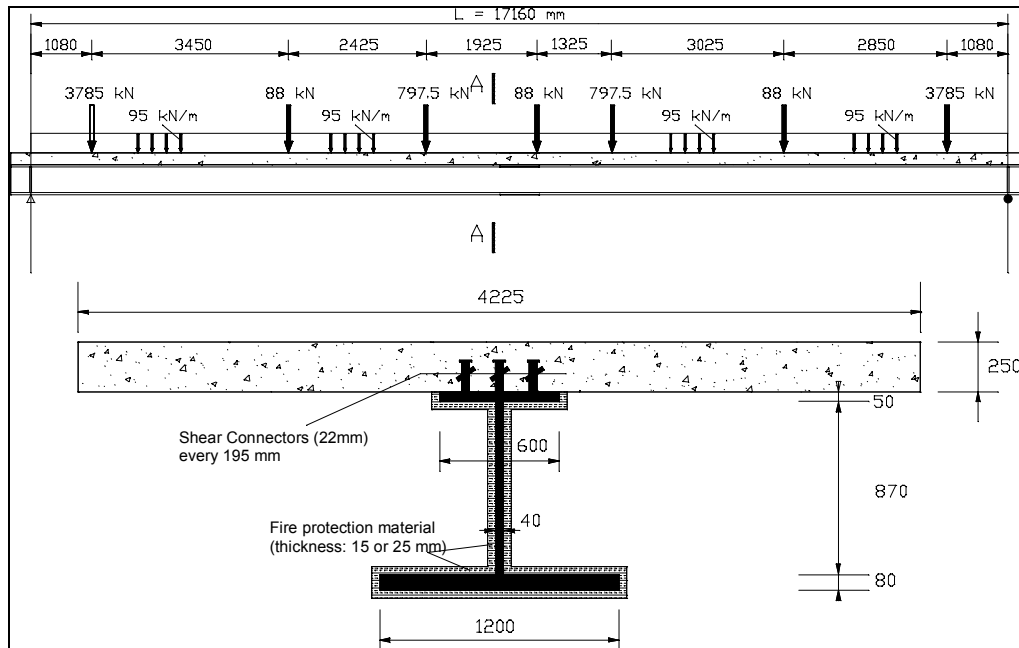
Composite beam of 17,16 m span composed of an insulated steel section with a height of 1m.
